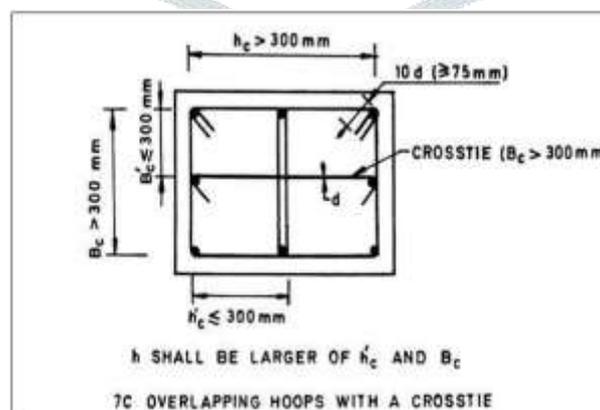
Shear reinforce detailing in beam according IS 13920 (2002)
